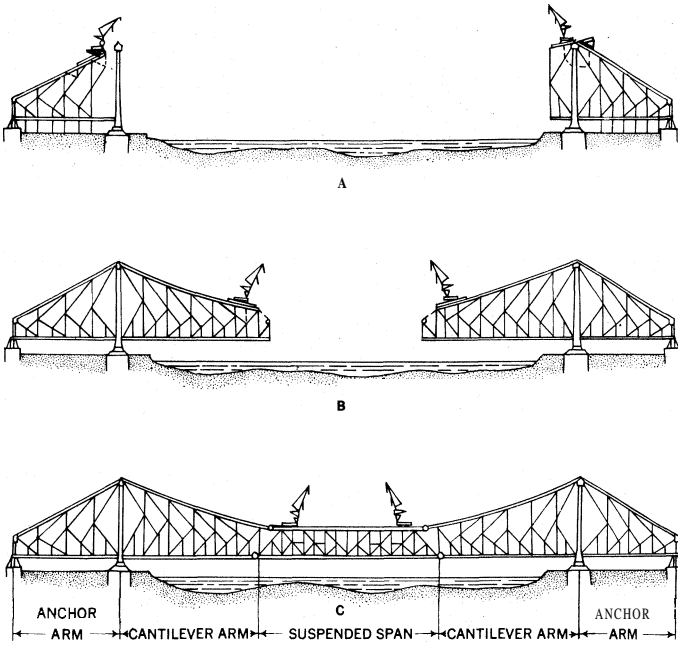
ERECTION OF HOWRAH BRIDGE, CALCUTTA, INDIA: (A) ANCHOR ARMS ERECTED ON STAGING; (B) ERECTION OF CANTILEVERS; (C) ERECTION OF SUSPENDED SPAN
